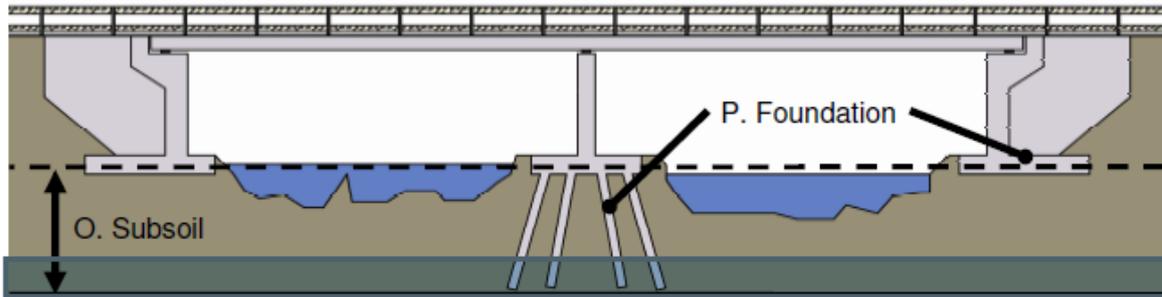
EXAMPLE OF A FOUNDATION WITH PILES OR SLABS (P) RESTING ON SUBSOIL (O), SB-STR (2007), ML-D1.4 (2014).
